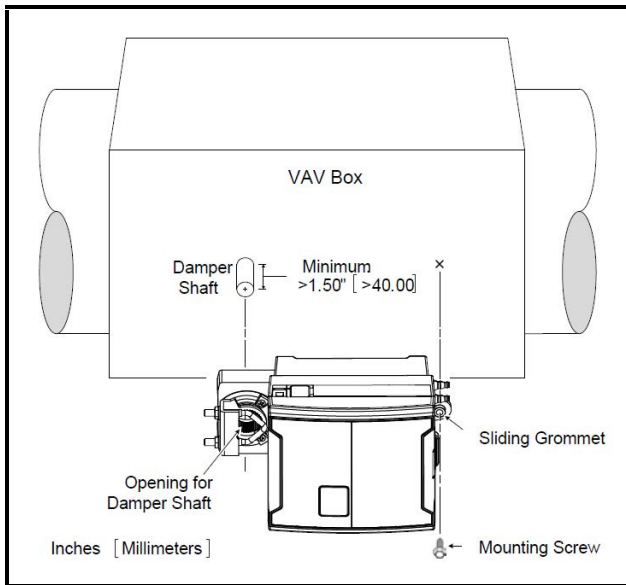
VAV Damper Shaft Standard Mounting Diagram
